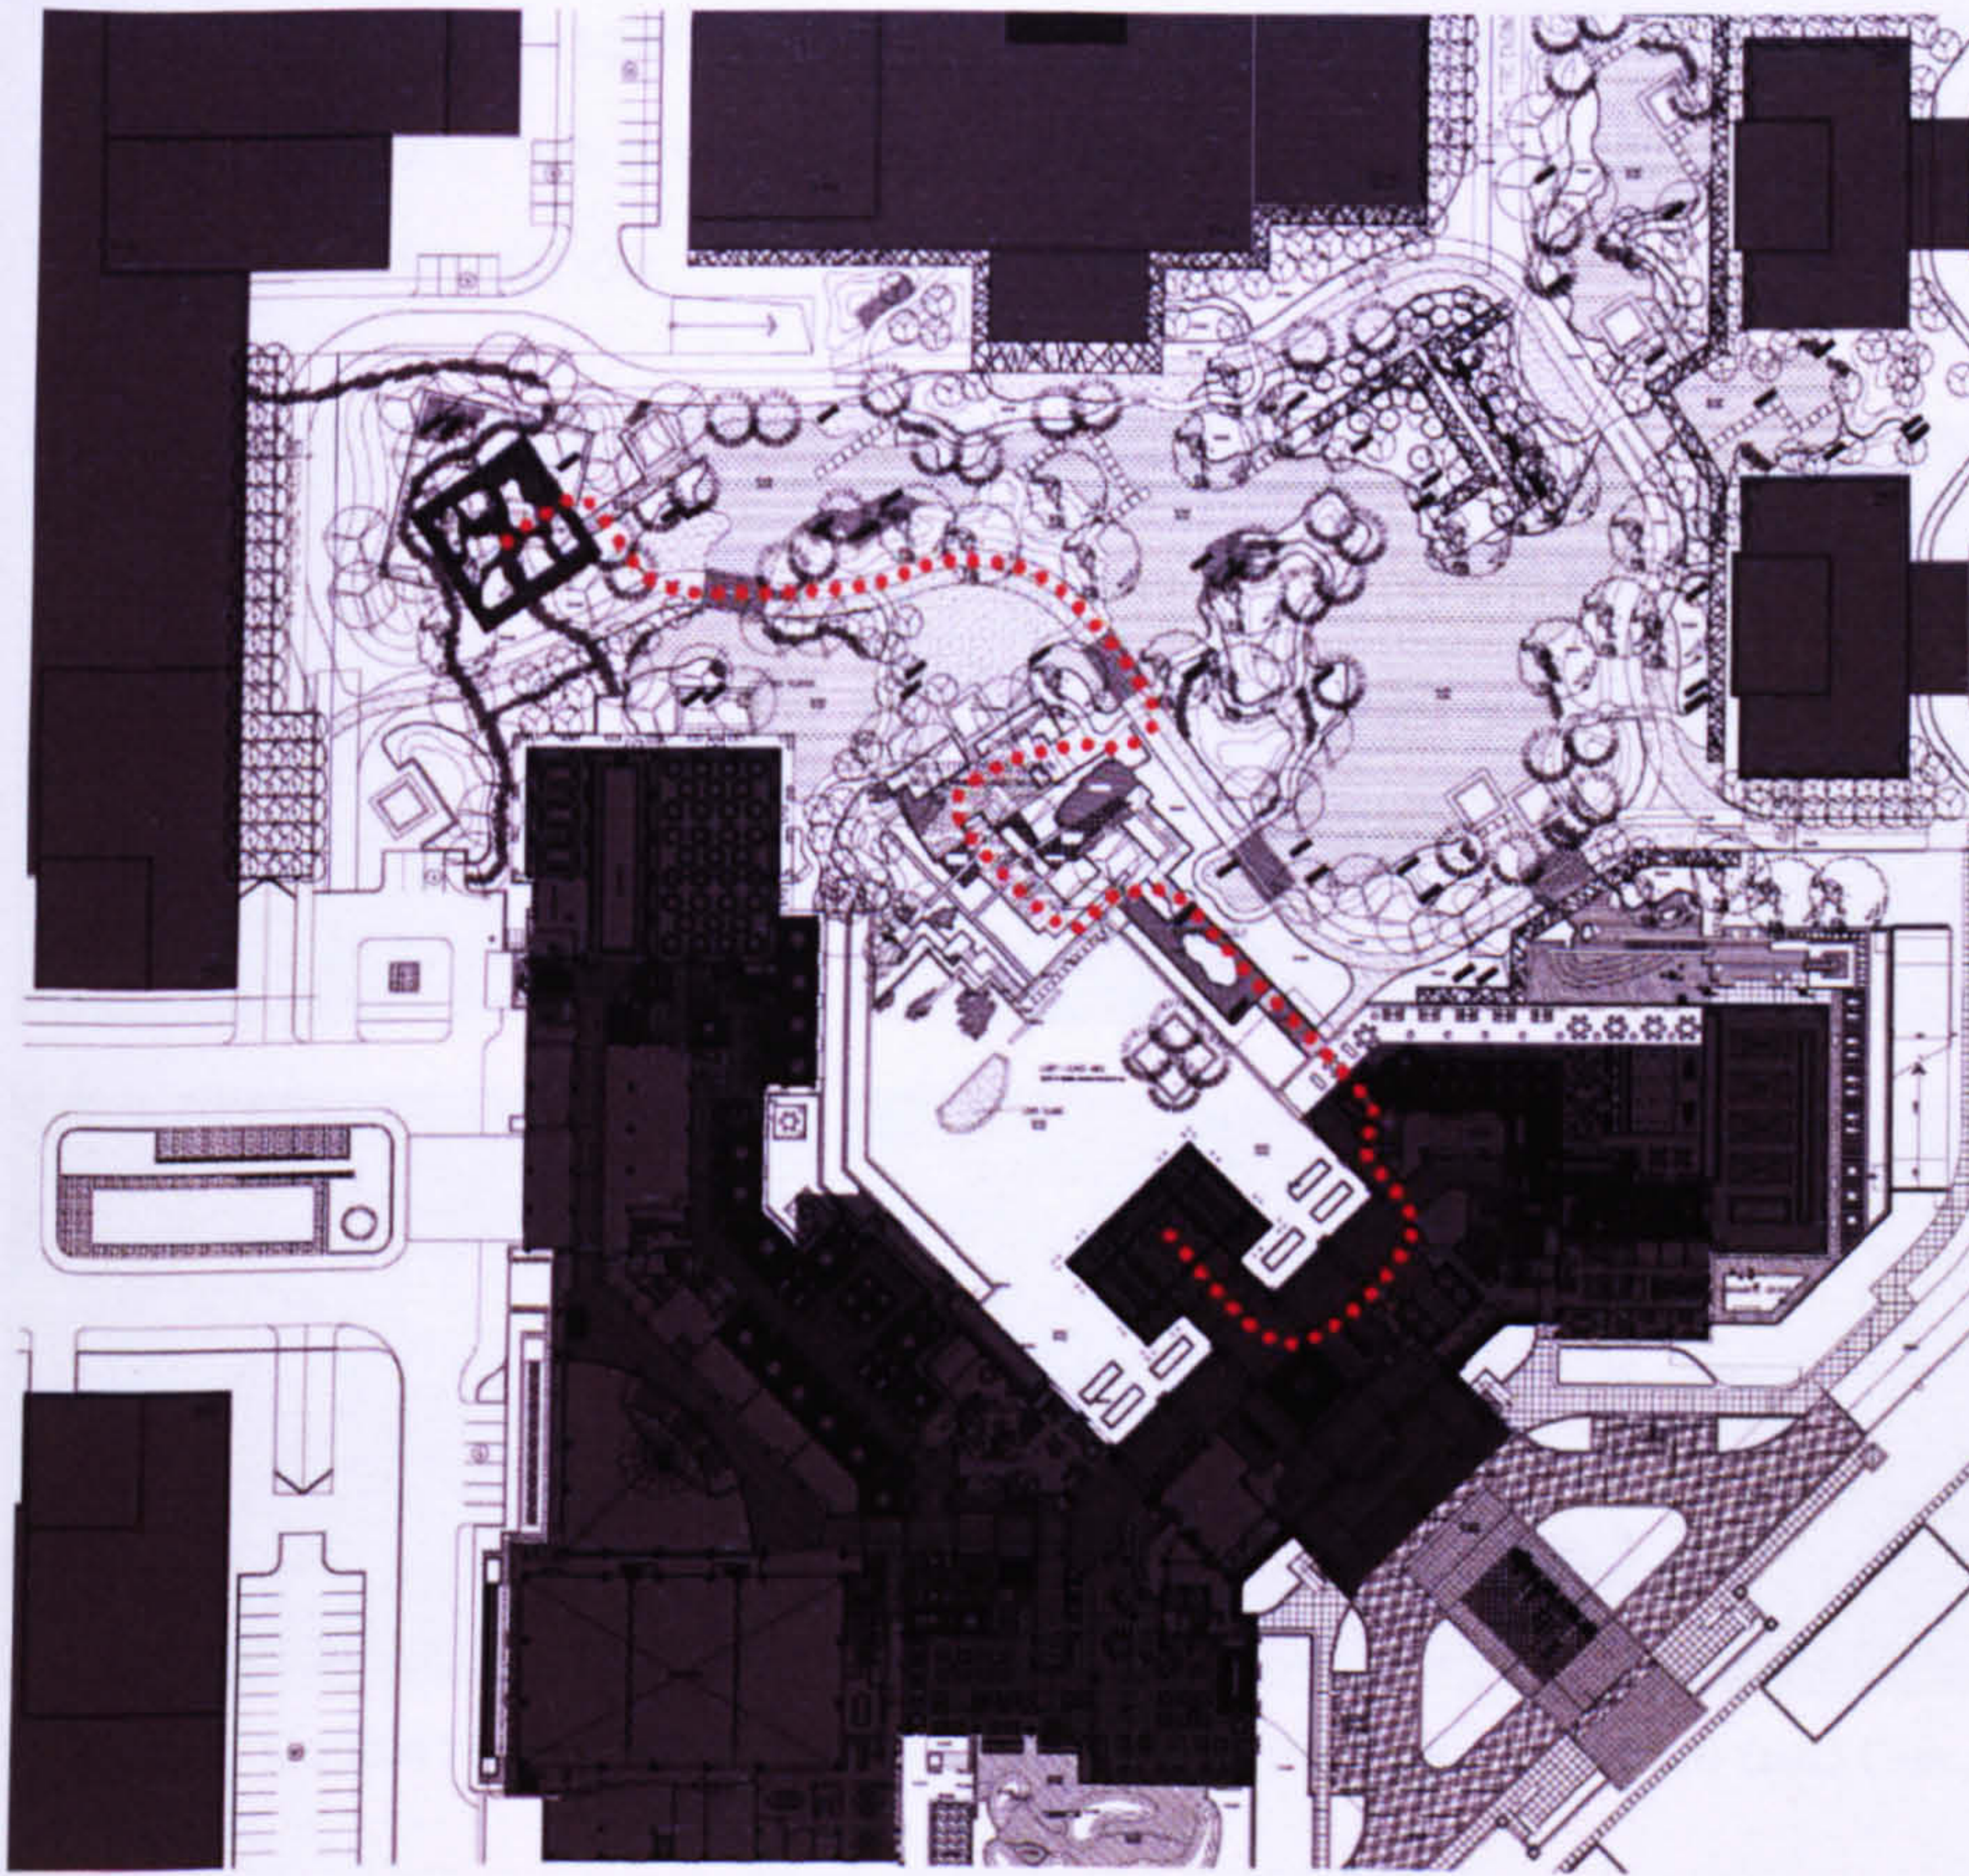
Art Gardens within a Tea Garden*, Beilun, China – Site Plan
